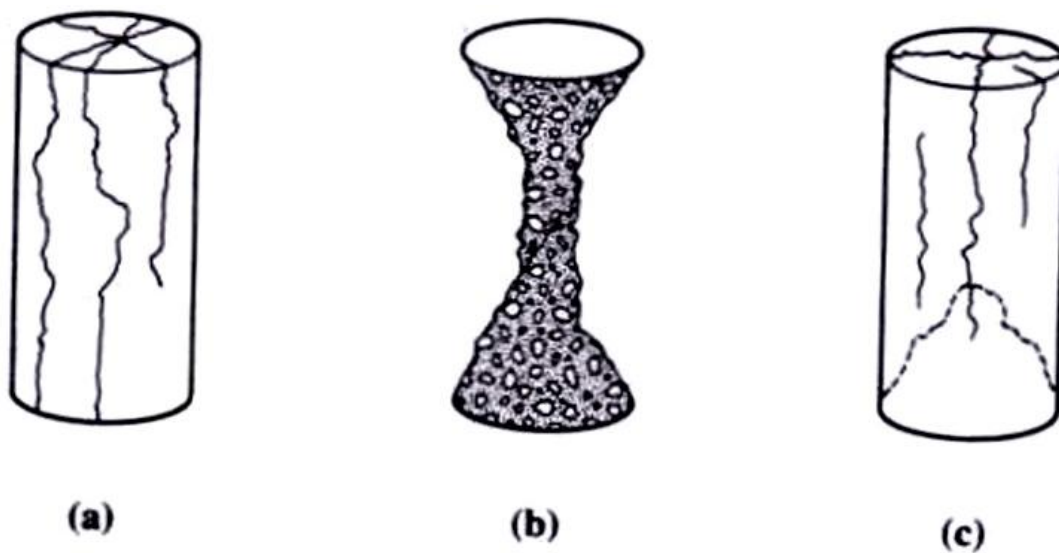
Various failure mode of concrete Cylindrical specimen under the compression loading test
